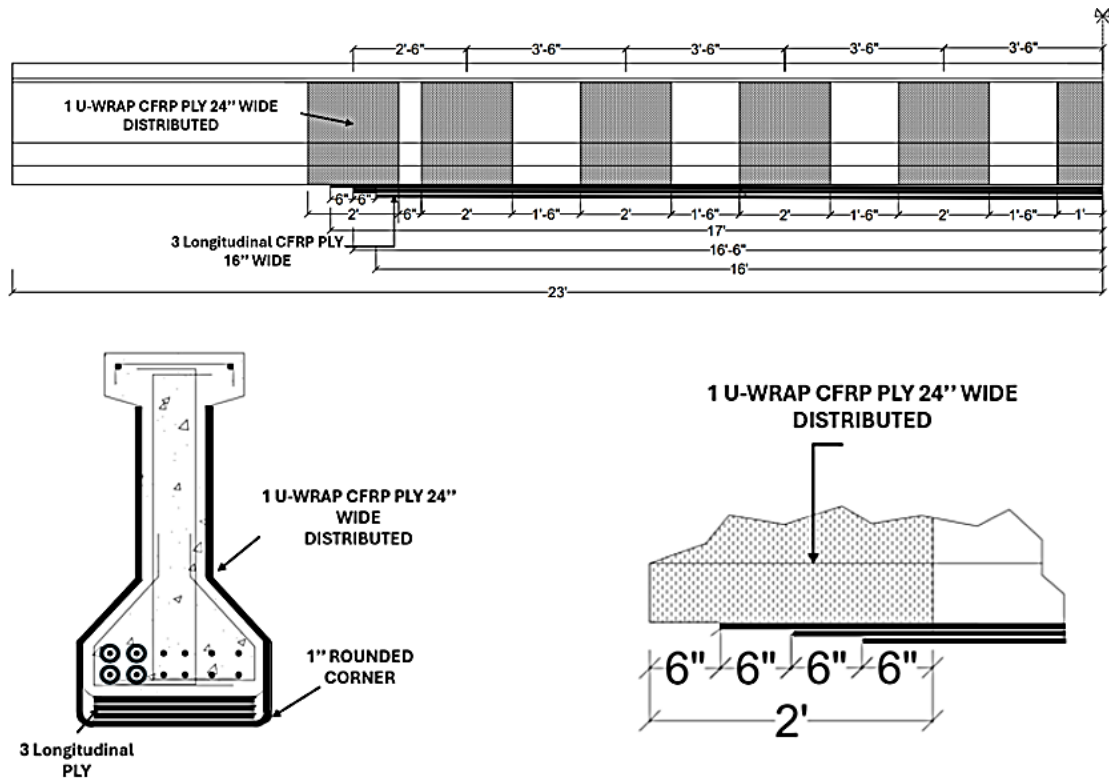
(a) Elevation of repair of Girder G08, cross-section and CFRP U-wrap details, and termination details for longitudinal CFRP
